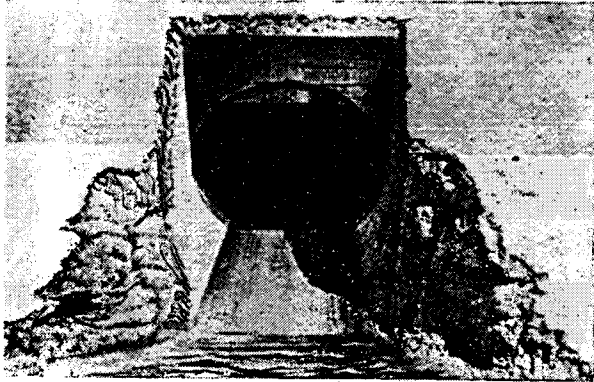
Cavitation destruction of concrete of the junction between the outlet portal of the deep conduit and spillway face.
